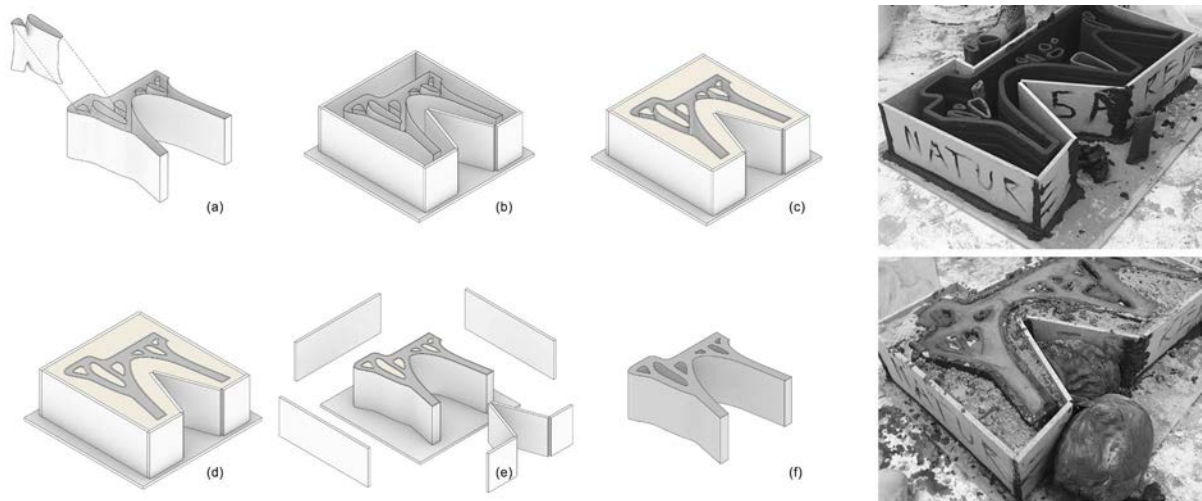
Mould assembly and concrete casting. Left: (a) Assembling 3D printed clay components into the mould for monolithic casting, (b) Surrounding the mould with MDF, (c) Filling the gap between clay and MDF with sand, (d) Casting concrete, (e) Removing sandbox support, (f) Demoulding clay. Photos on the right are fabrication in progress.
